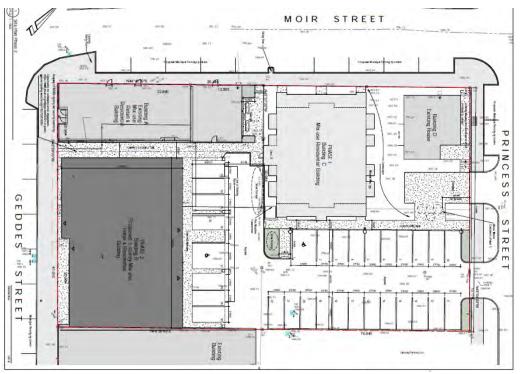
Site Plan (Source: Fryett Turner Architects Inc., 2021).
